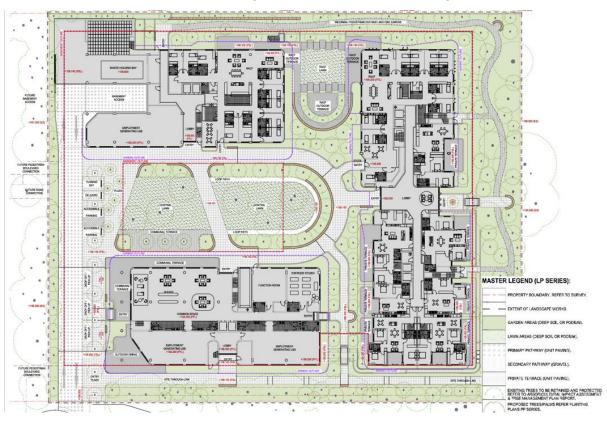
Landscape Plan (Source: Paddock Landscape Architects)
